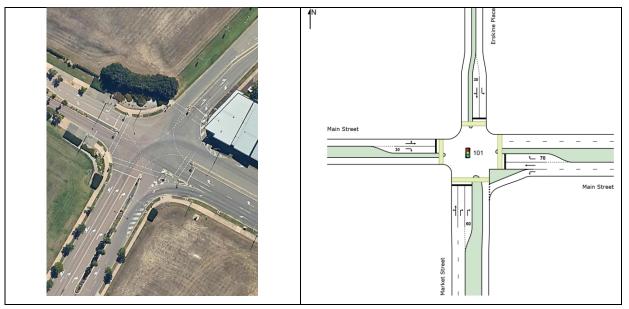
Main Street / Market Street Signalised Intersection Layout
